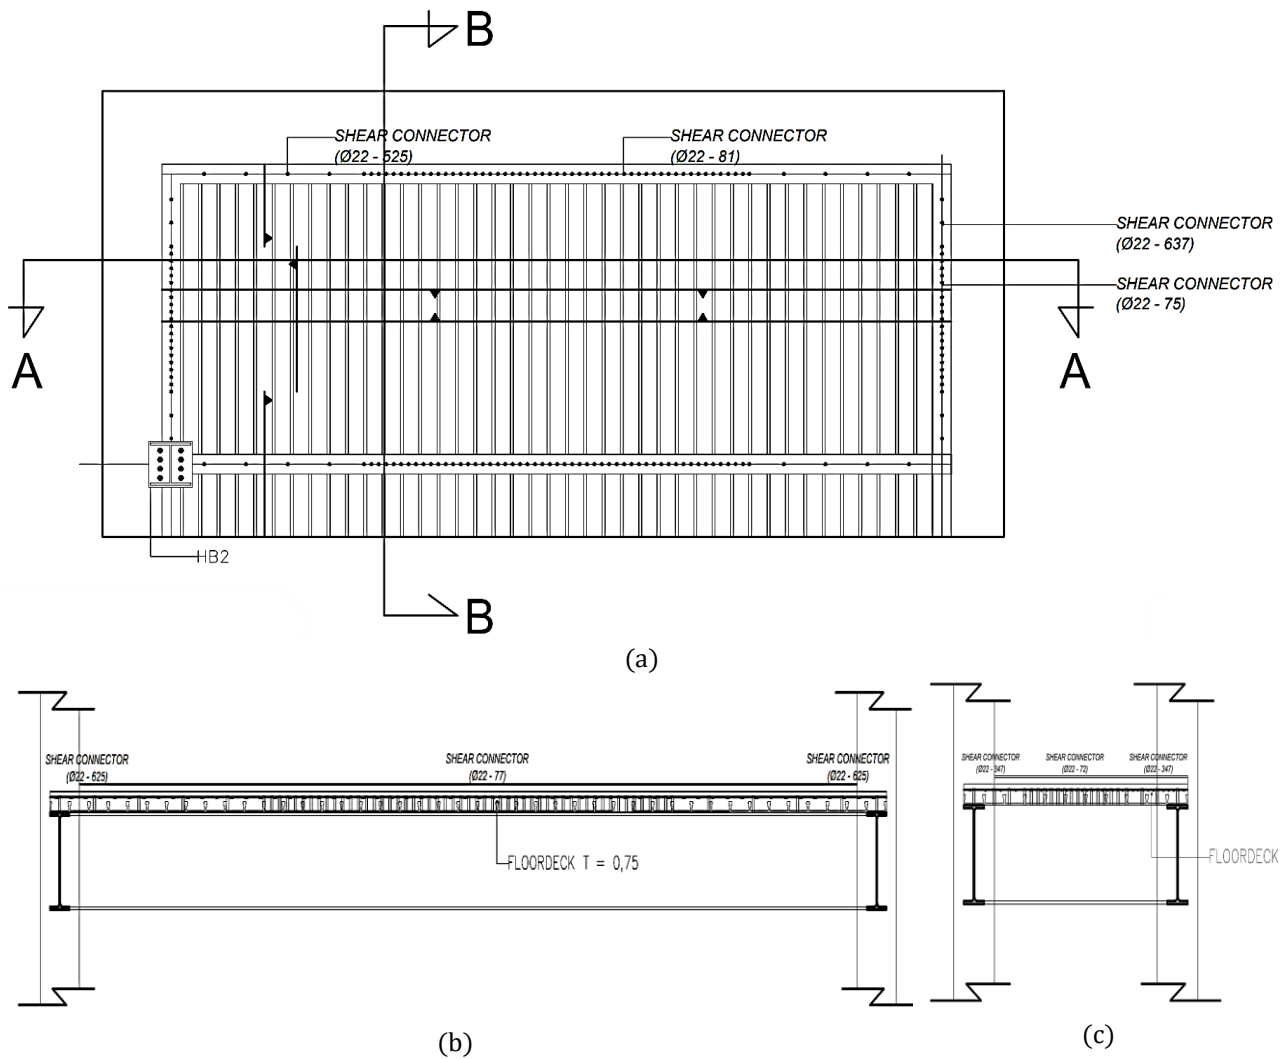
Typical detail of design: (a) plan view; (b) A-A view; (c) B-B view.
